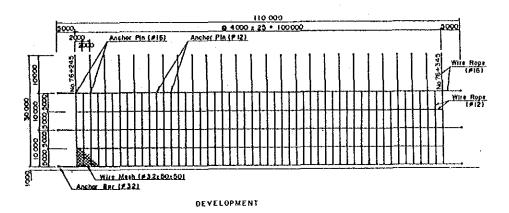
(6) Catch Net and Gabion Wall (Type 9/10)
